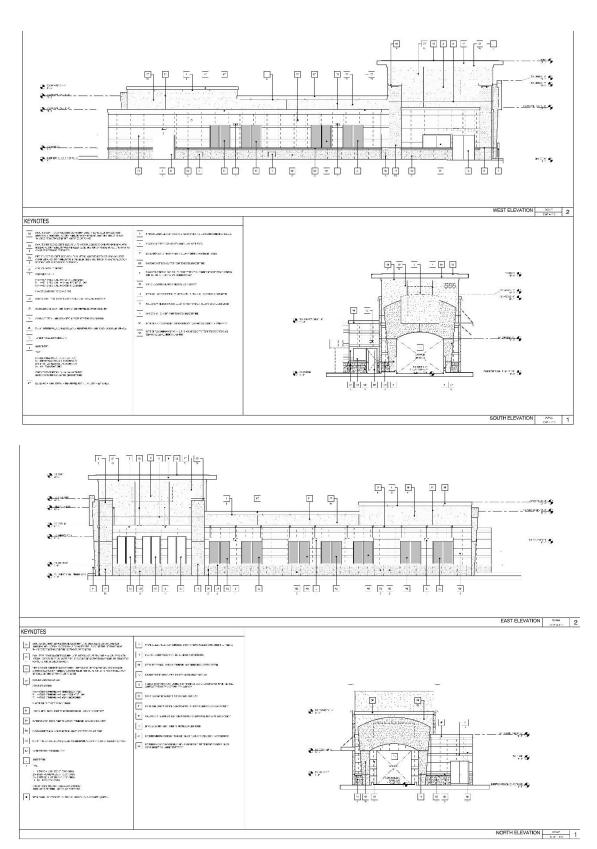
PROPOSED BUILDING ELEVATIONS Source: LA Design Group Inc.
